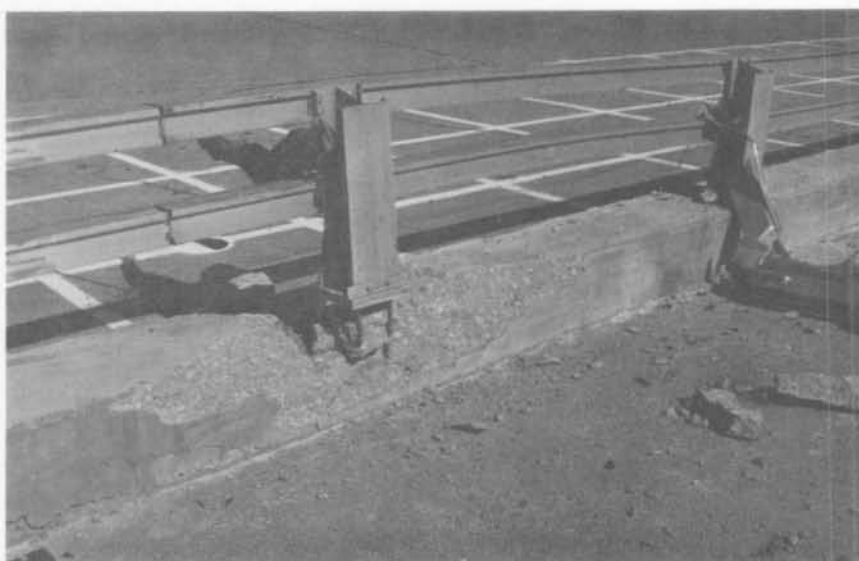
PHOTOGRAPHS OF BOX-ALUMINUM BRIDGE RAIL DAMAGE, TEST I1-2
